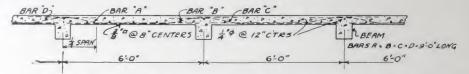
Section through beams and slabs showing typical bar design for slabs.
